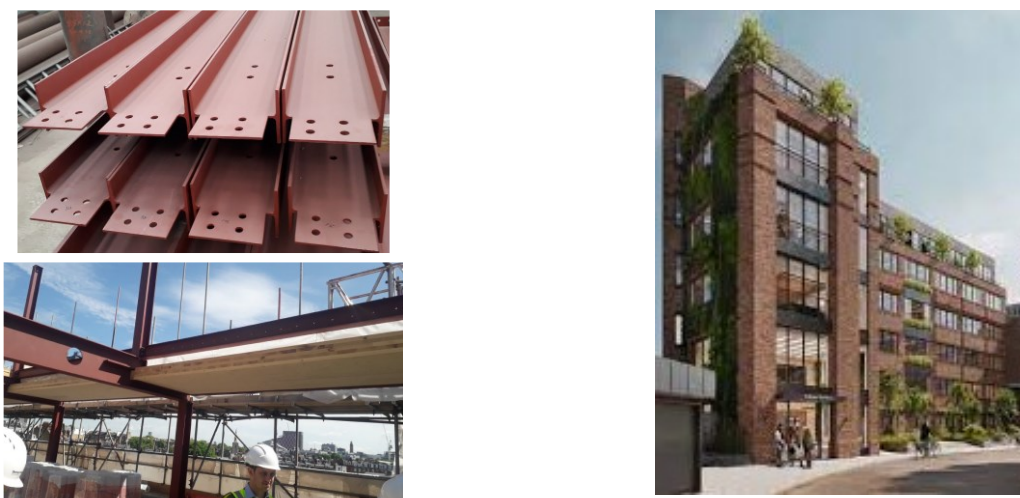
“Grosvenor Estate” building reclaimed steel (upper/left); new structure made of reclaimed steel (bottom/left); appearance of extended building in London (right) [77]
